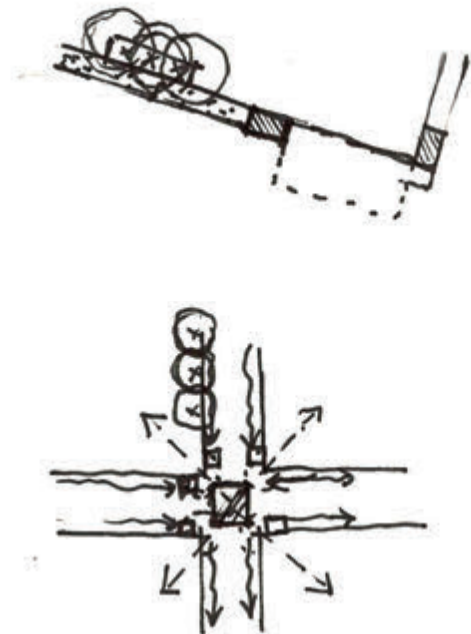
(left) Collecting surface runoff at existing gutter inlets
